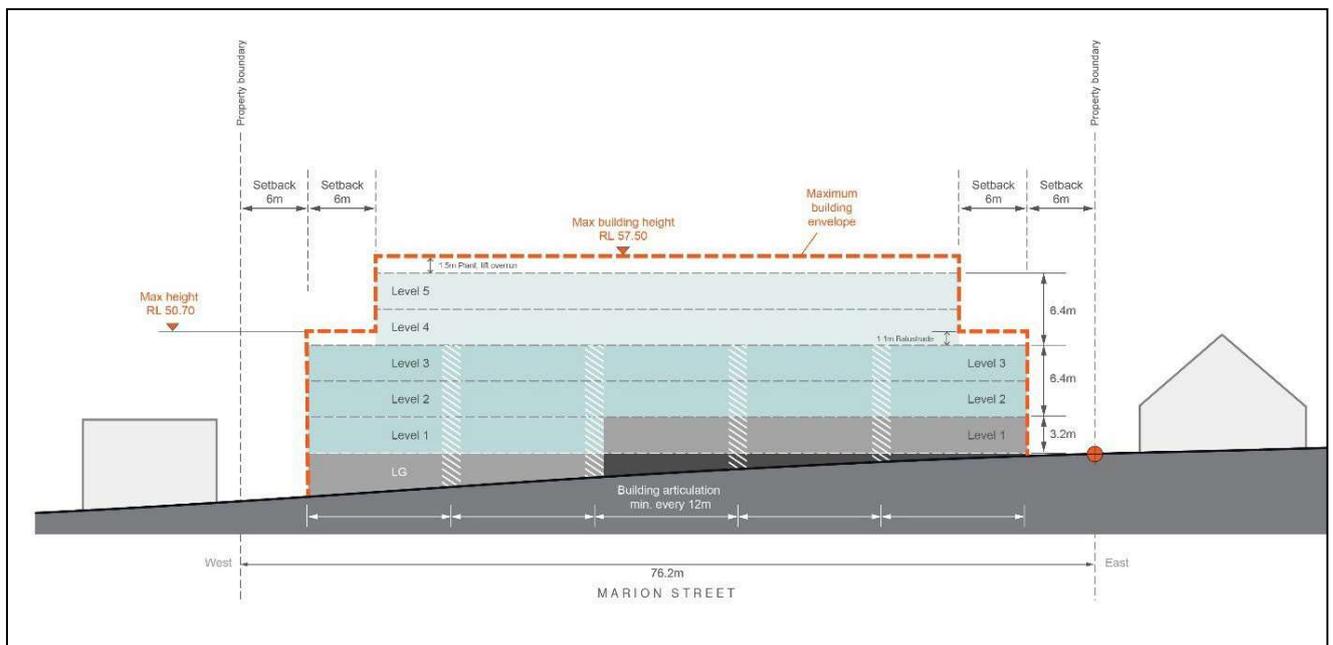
Building Heights and Massing Envelope – Section B (east-west)
